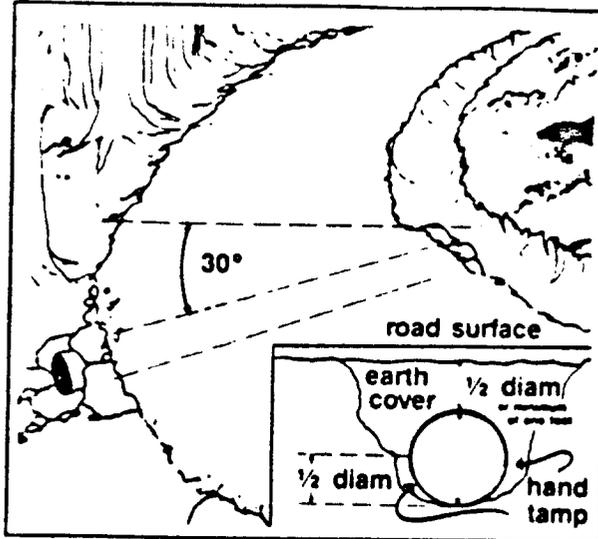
Design and installation of pipe culverts (Vermont Department of Forests, Parks and Recreation, 1987).
